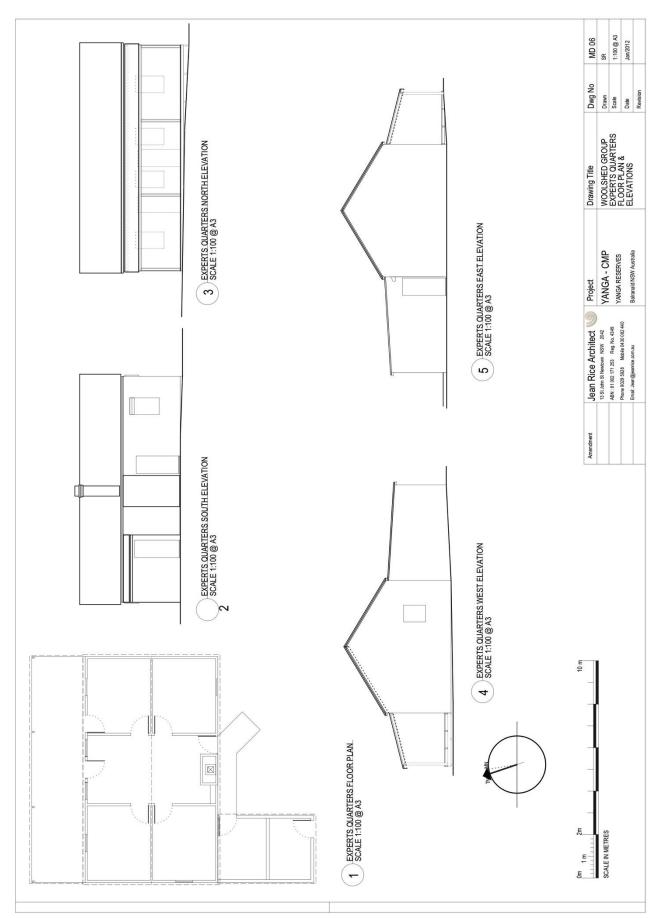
Woolshed Group, Experts Quarters floor plan and elevations. Jean Rice Architect, site assessed 2009.
